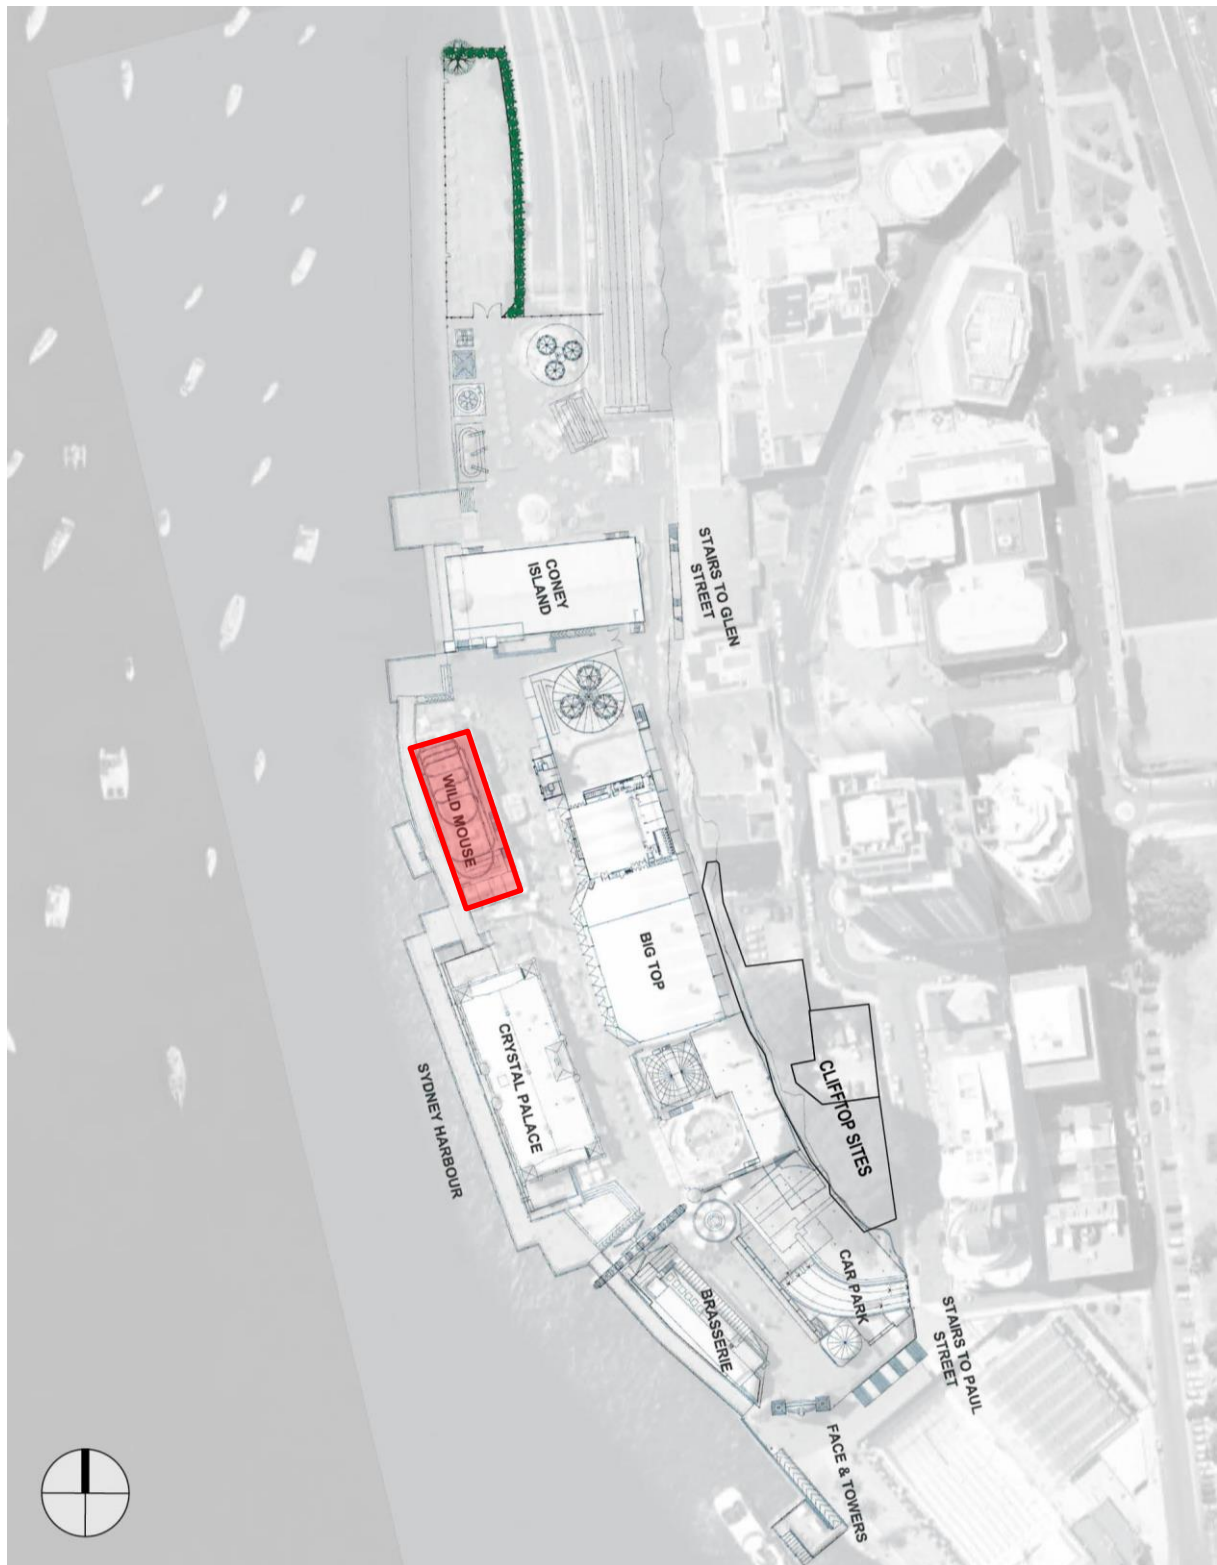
Figure A Site plan showing location of the Wild Mouse ride and structure (shaded in red). (Source: Luna Park Sydney with GML overlay)
